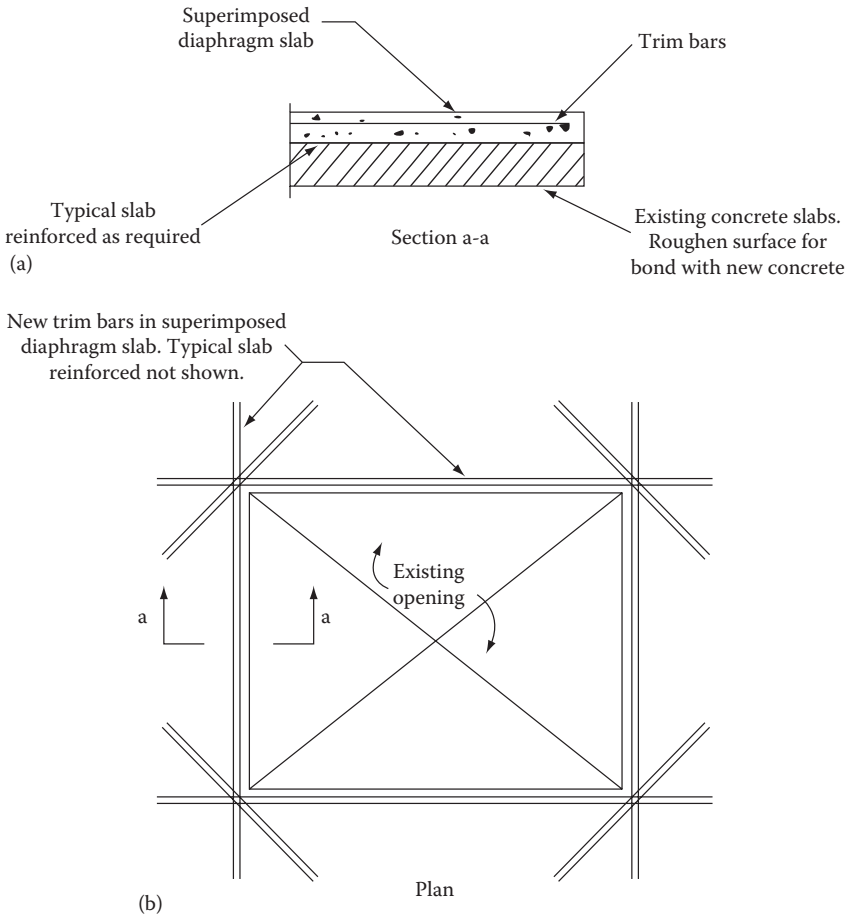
Strengthening of openings in a superimposed diaphragm: (a) section; and (b) plan.
